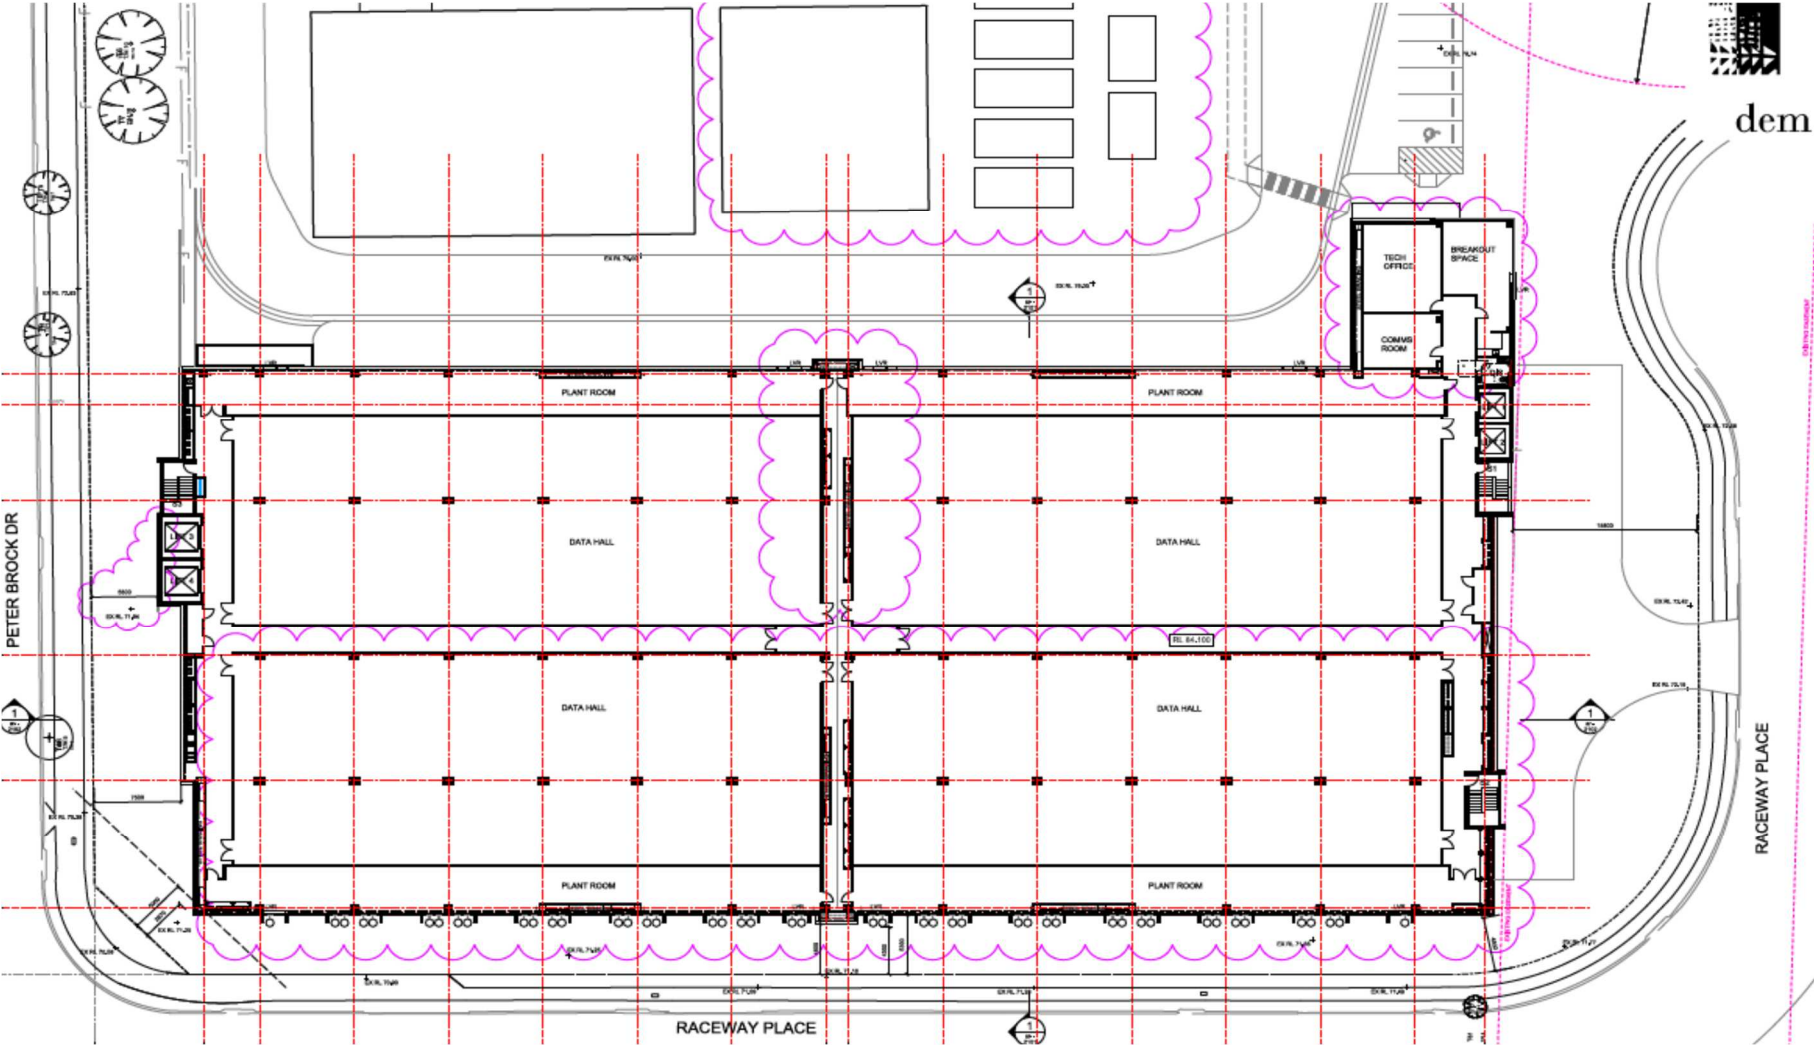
Level Two Floor Plan of the DCI SYD02 Data Centre.
